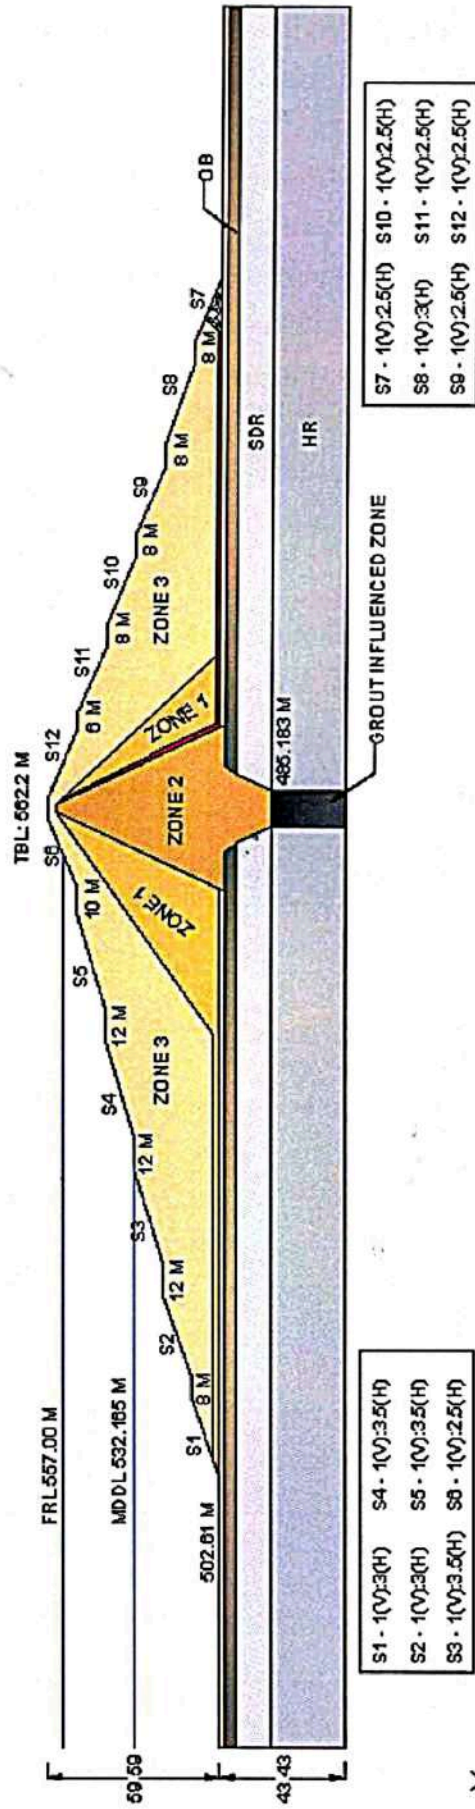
Design dam section 'I' (Maximum height section at Ch. 15.6 km)
